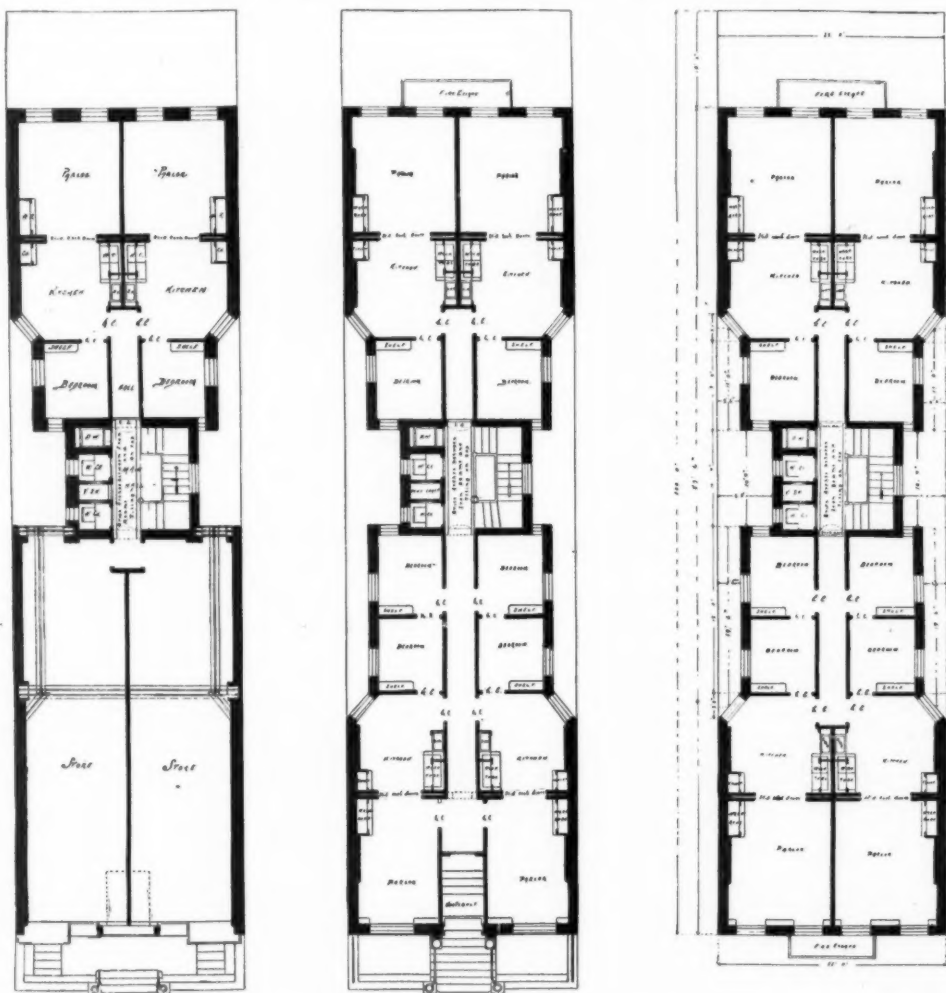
Prize Plan, Tenement-house Design Competition of 1879, New York City.
